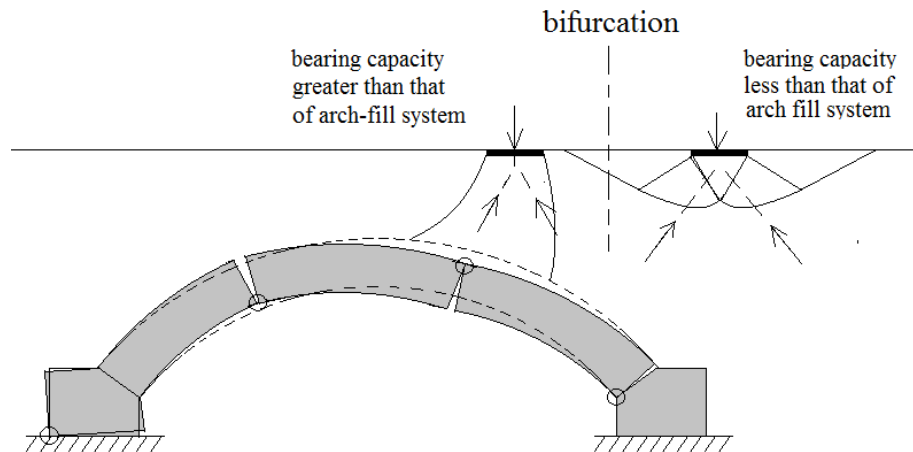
Illustrating the bifurcation between two failure modes of the system: bearing failure of the fill and arch-fill system failure
